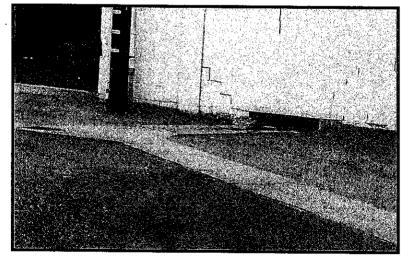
Wall Opening for Drainage to Alley 44 from Adjacent Property
